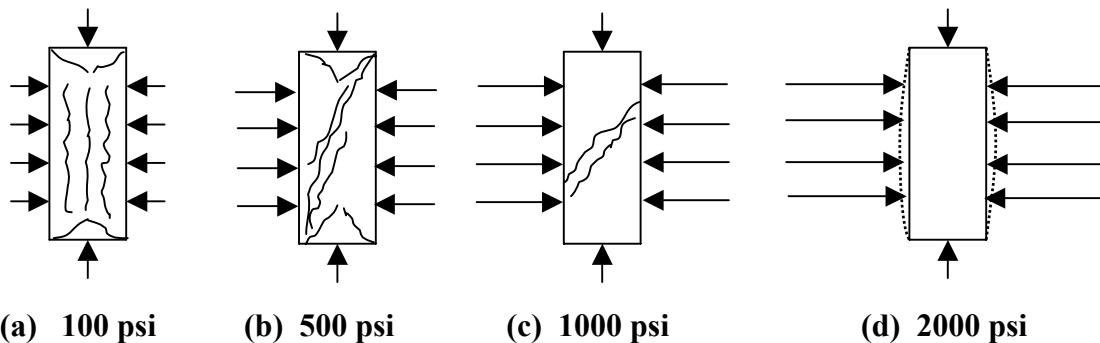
Failure Modes of Concrete Cylinders under Various Confining Stresses
